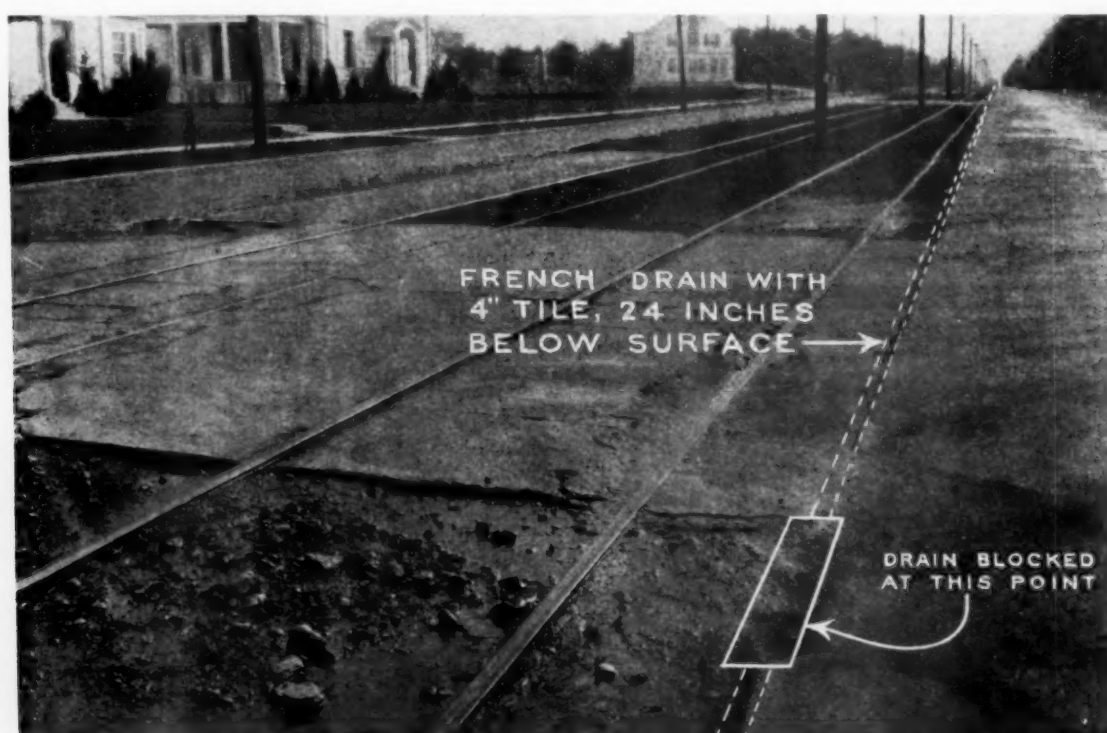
SECTION 3, NORTH OF BRADLEY LANE, FEBRUARY, 1929. HEAVY FLOW OF WATER RISING TO THE SURFACE IMMEDIATELY UNDER WEST RAIL ON NORTH SIDE OF VIRGILIA STREET INTERSECTION. NOTE BITUMINOUS PATCH ON THE RIGHT WHICH WAS NECESSITATED BY SETTLEMENT CAUSED BY THE IMPROPER BACK FILLING OF A SERVICE CUT. THE EAST DRAIN WAS STOPPED AT THIS POINT.
